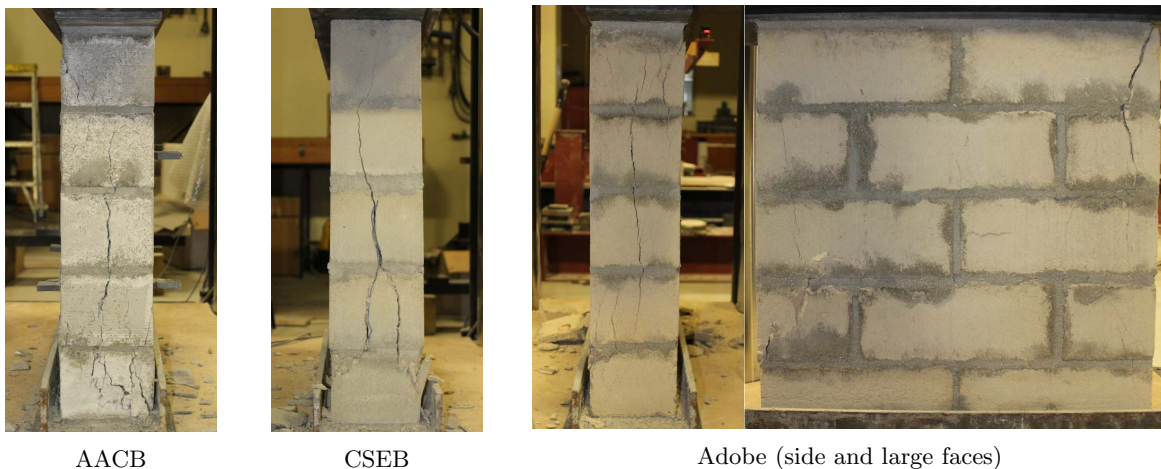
Vertical Cracks on Wallet Specimens
